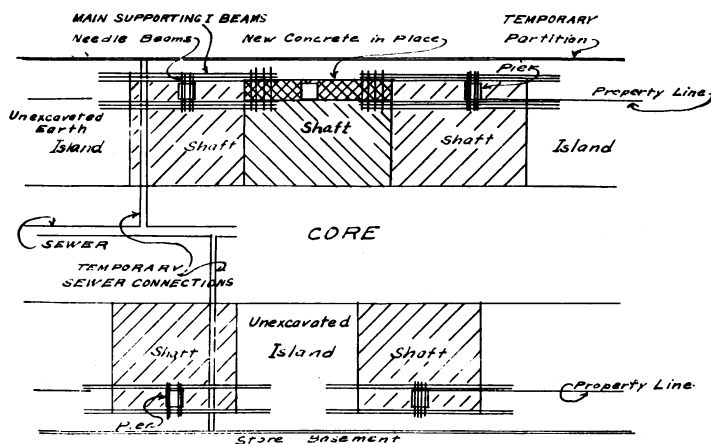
Plan of Underpinning, Section A, Dorchester Tunnel
